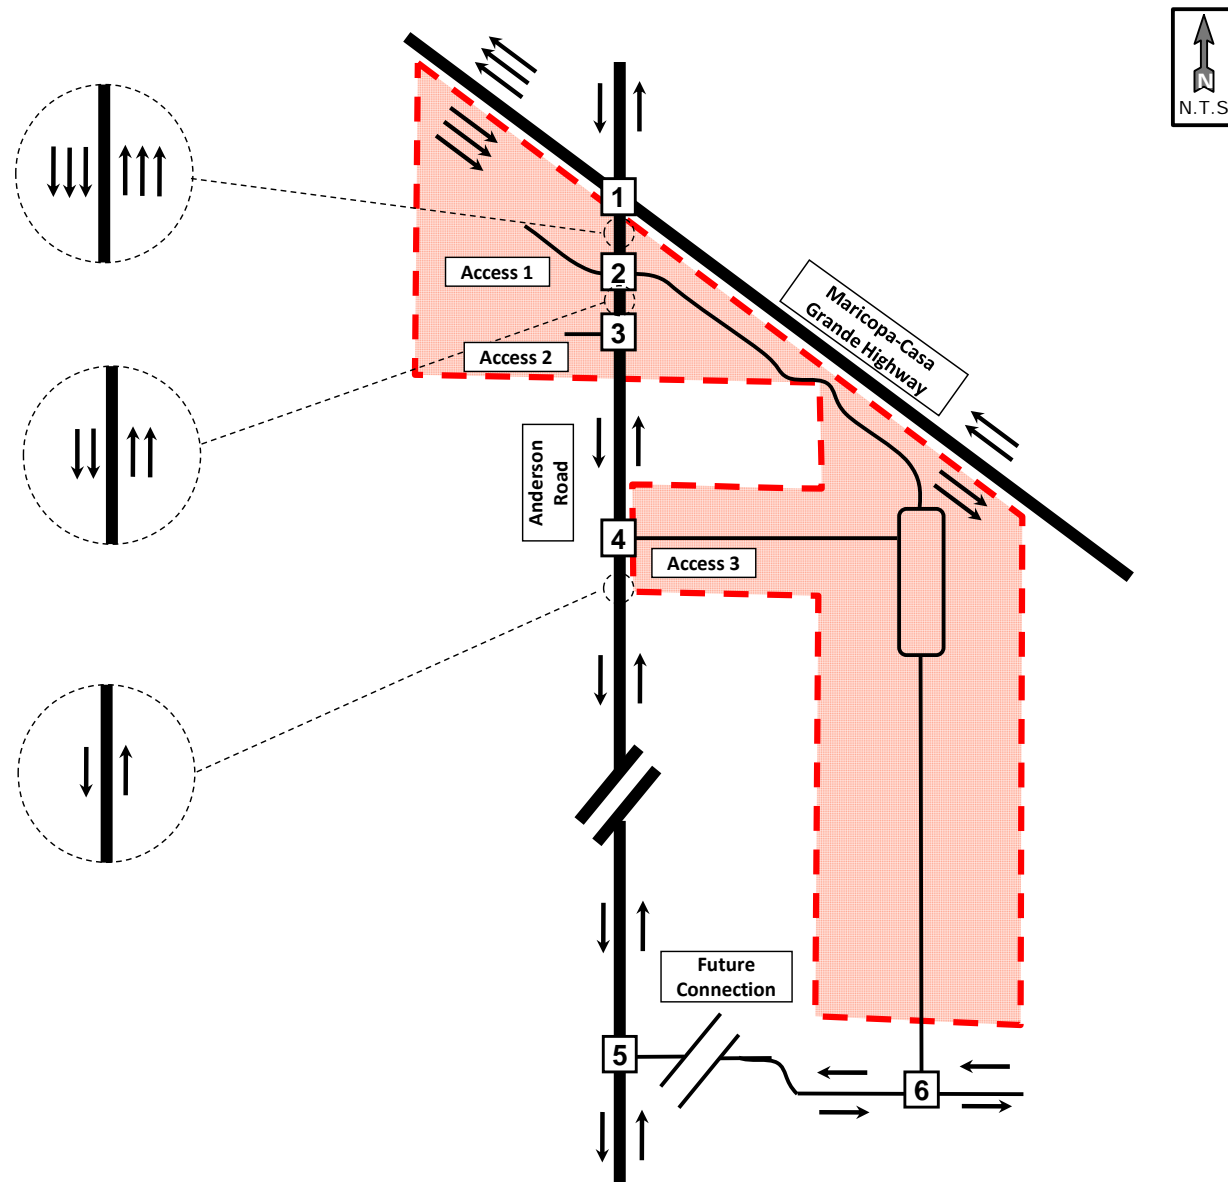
2030 with Site (Phase 1, 2 & 3) Recommended Roadway Cross-sections
